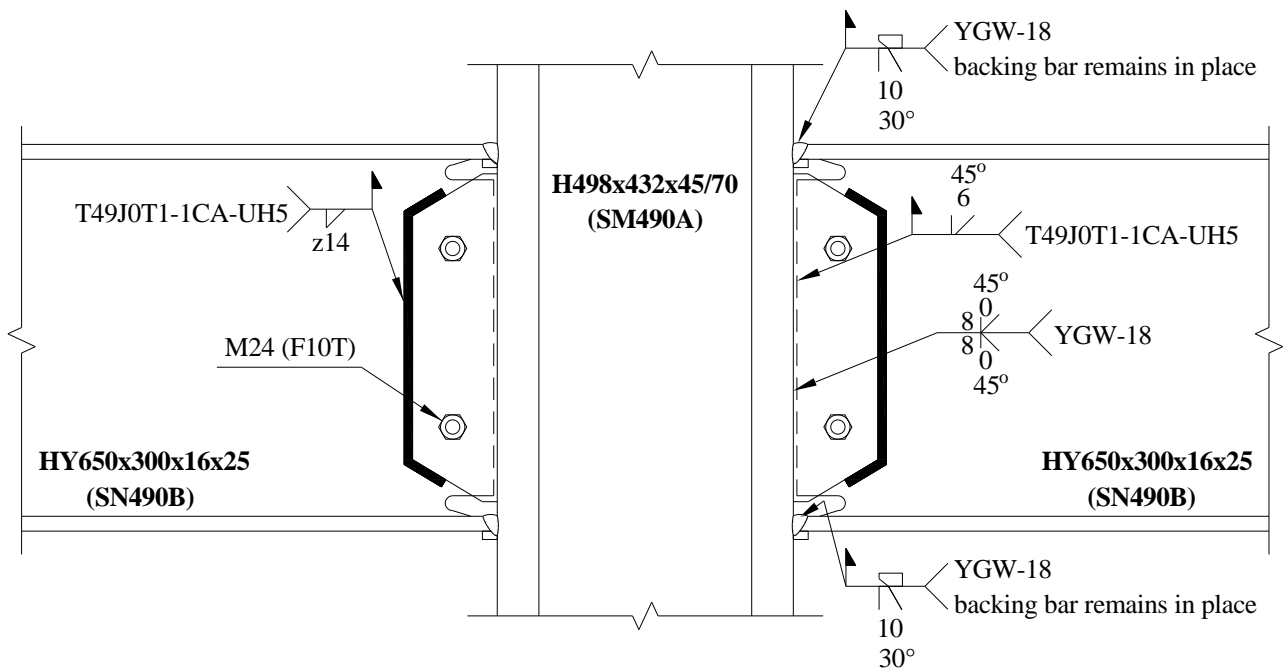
Beam-to-column connection detailing of Specimen 2.
